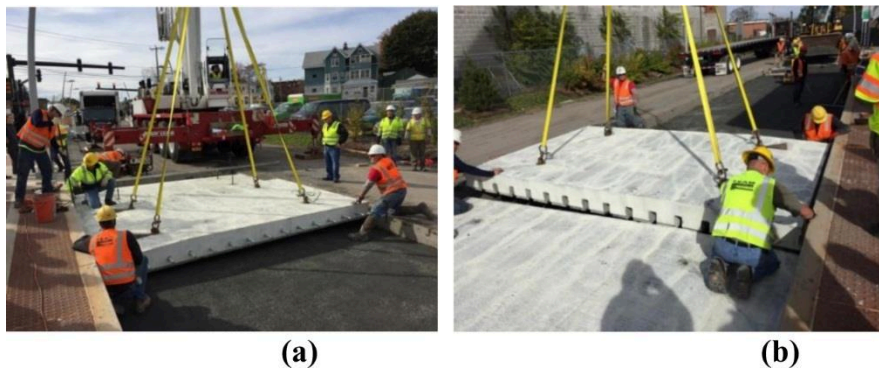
Precast panels used: (a) dowel bars embedded at one transverse side; and (b) dowel bar slots along the opposite side.
